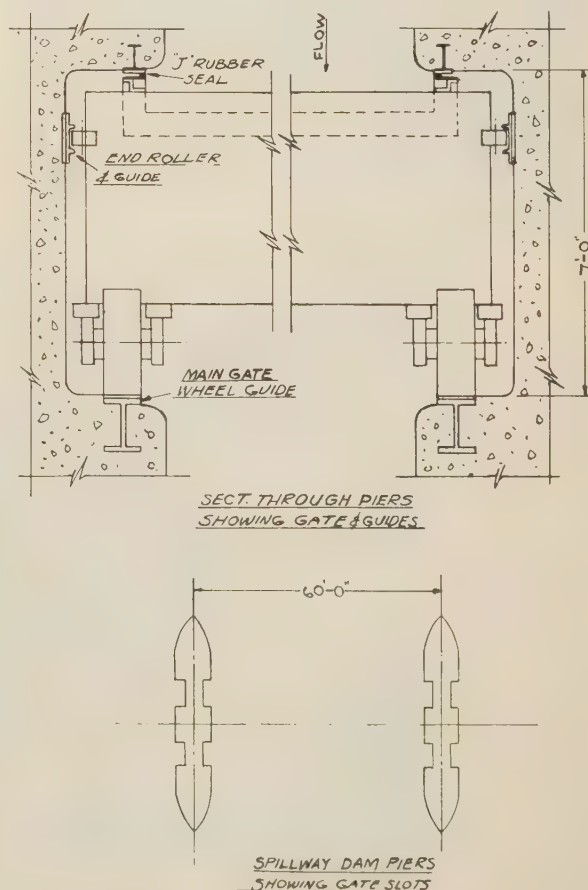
SECTIONS THROUGH PIERS, SHOWING GENERAL ARRANGEMENT OF CONCRETE PIERS, GATE, AND GATE GUIDES
